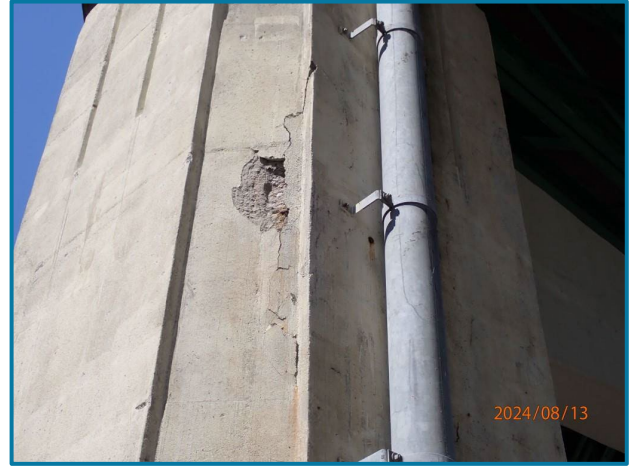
2' L x 5' H delamination with 1 SF x 1" spall (Pier 7, South Column, SE Corner, looking northwest).
